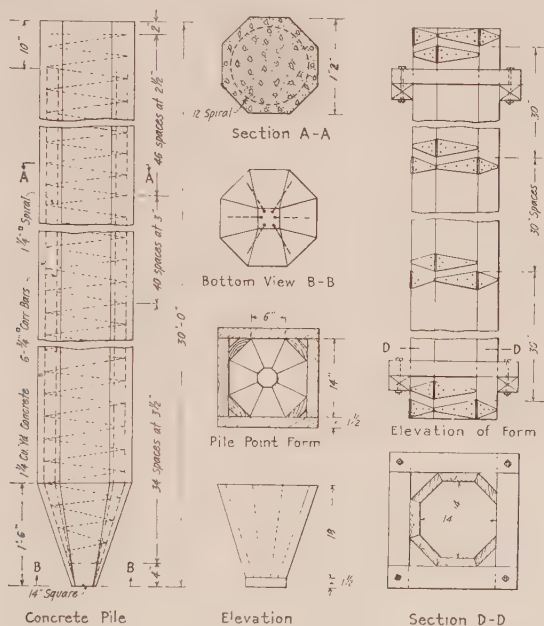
FORM FOR CASTING CONCRETE PILE.
